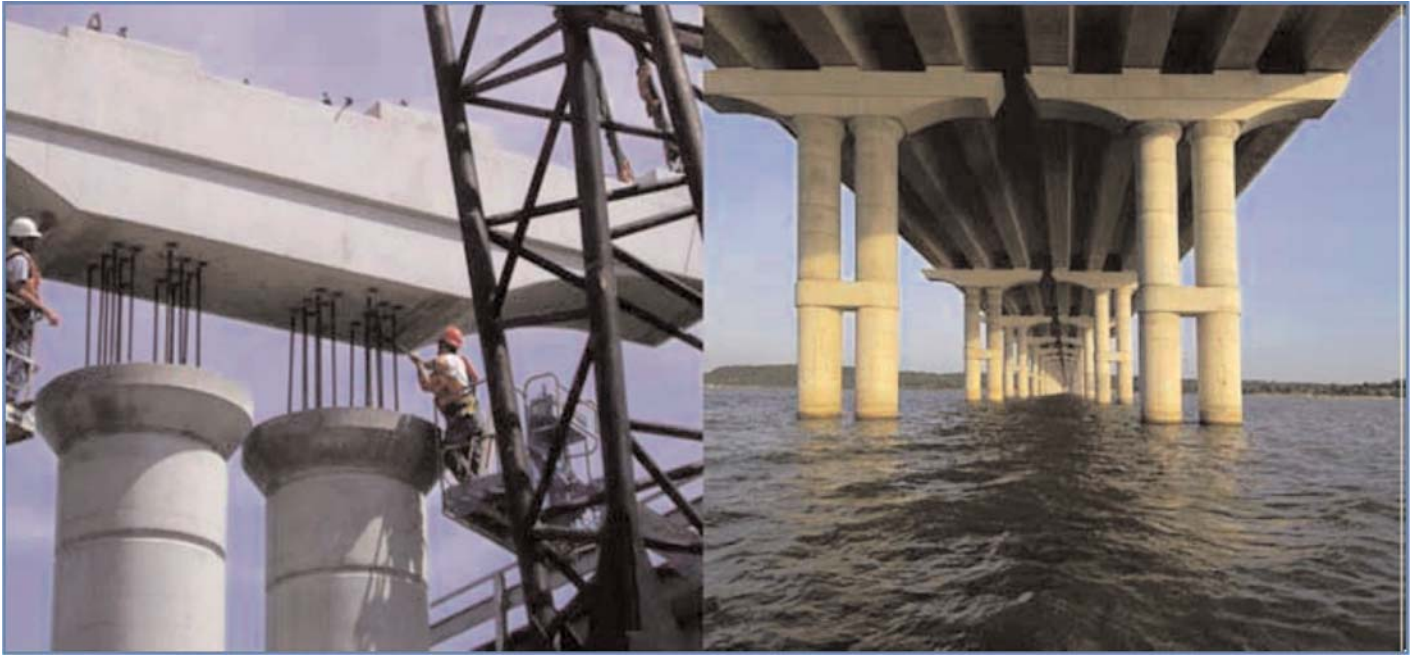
Precast concrete bent cap system used in crossing of State Highway 36 over Lake Belton, TX (7).
